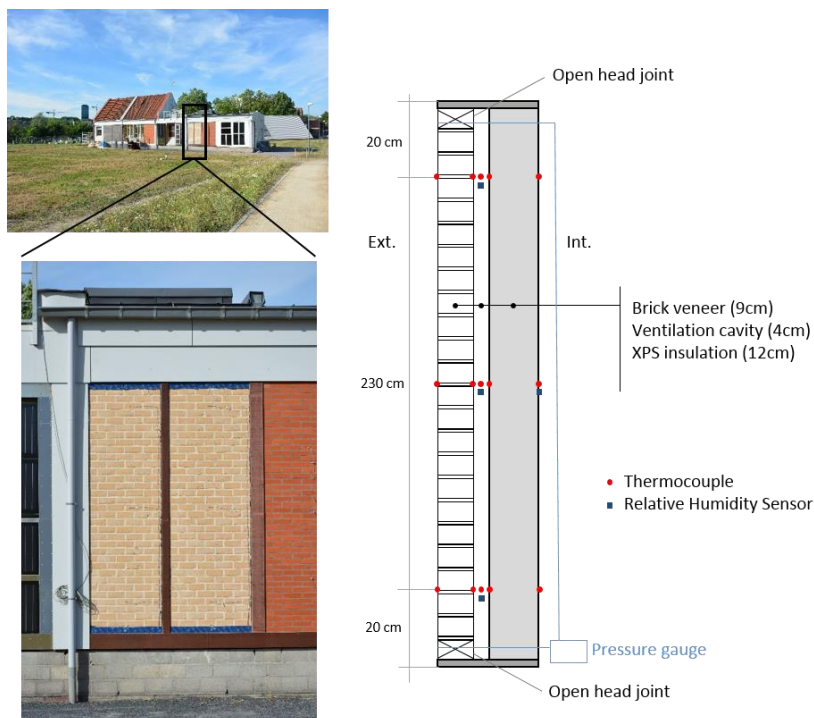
South-West wall of the VLIET building and measuring set-up (based on [16])
